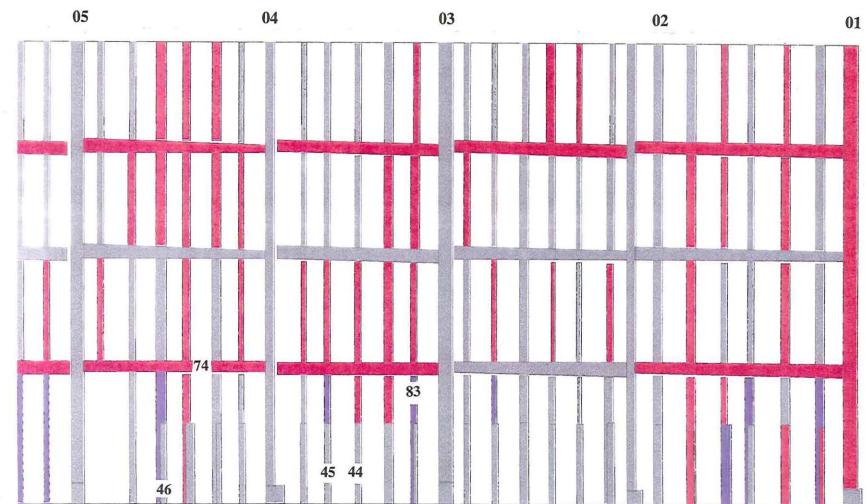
(2): North elevation of choir roof (eastern half) to show sample locations
